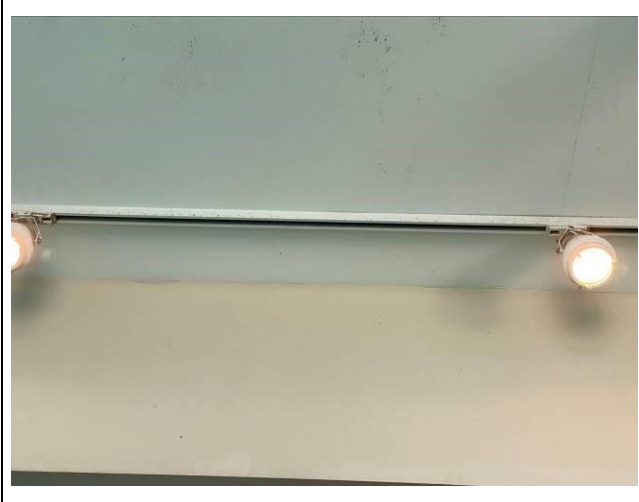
SVMG Observed on Metal Beams for Lights on First Floor
